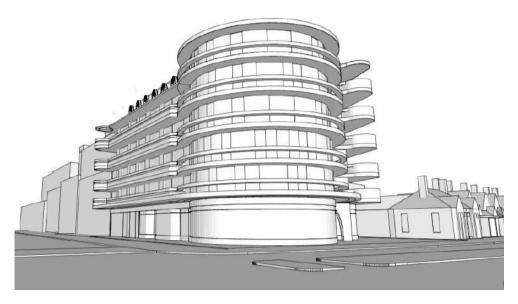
View to proposed scheme from Cross Street looking northwest
